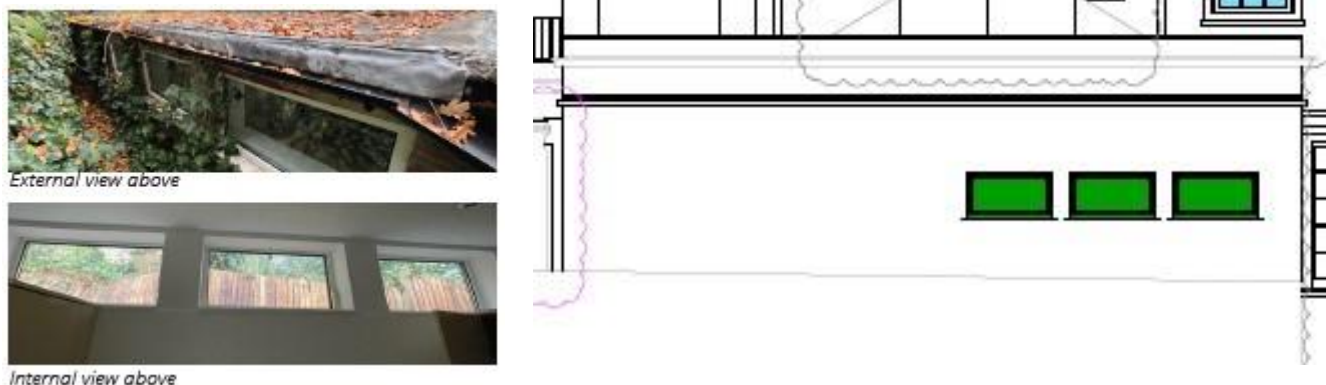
Existing internal and external photographs of the modern uPVC windows in the flank elevation (left) and extract from the proposed drawings showing the location of the windows in the flank elevation (right).
